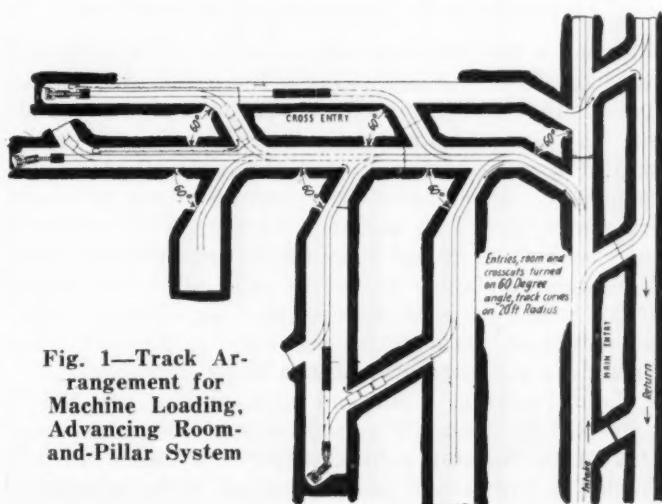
Track Arrangement for Machine Loading, Advancing Room-and-Pillar System
